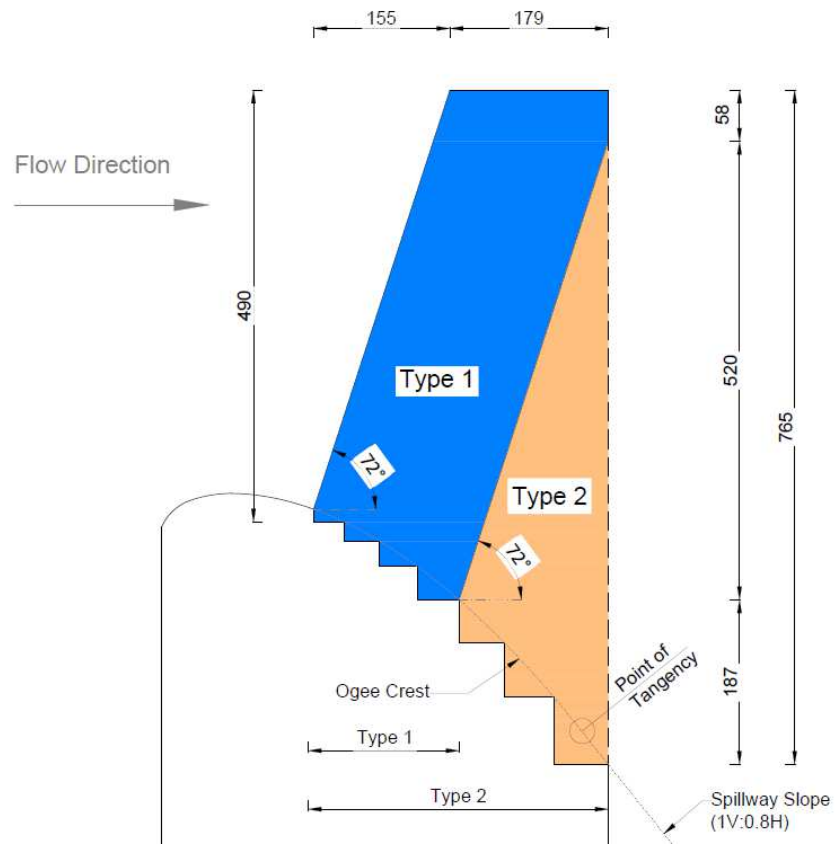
Side view of new model piers (types 1 and 2) – dimensions shown in mm
